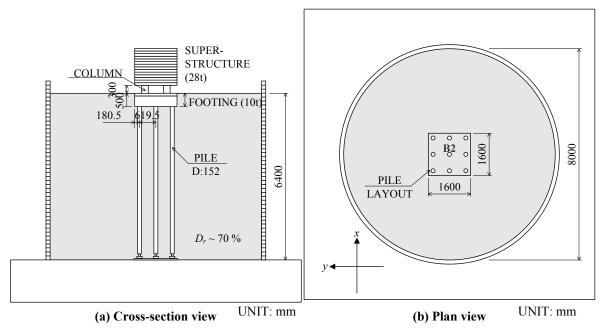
Illustration of one of the models and the coordinate system in the tests: (a) Cross-section and (b) plan views.
